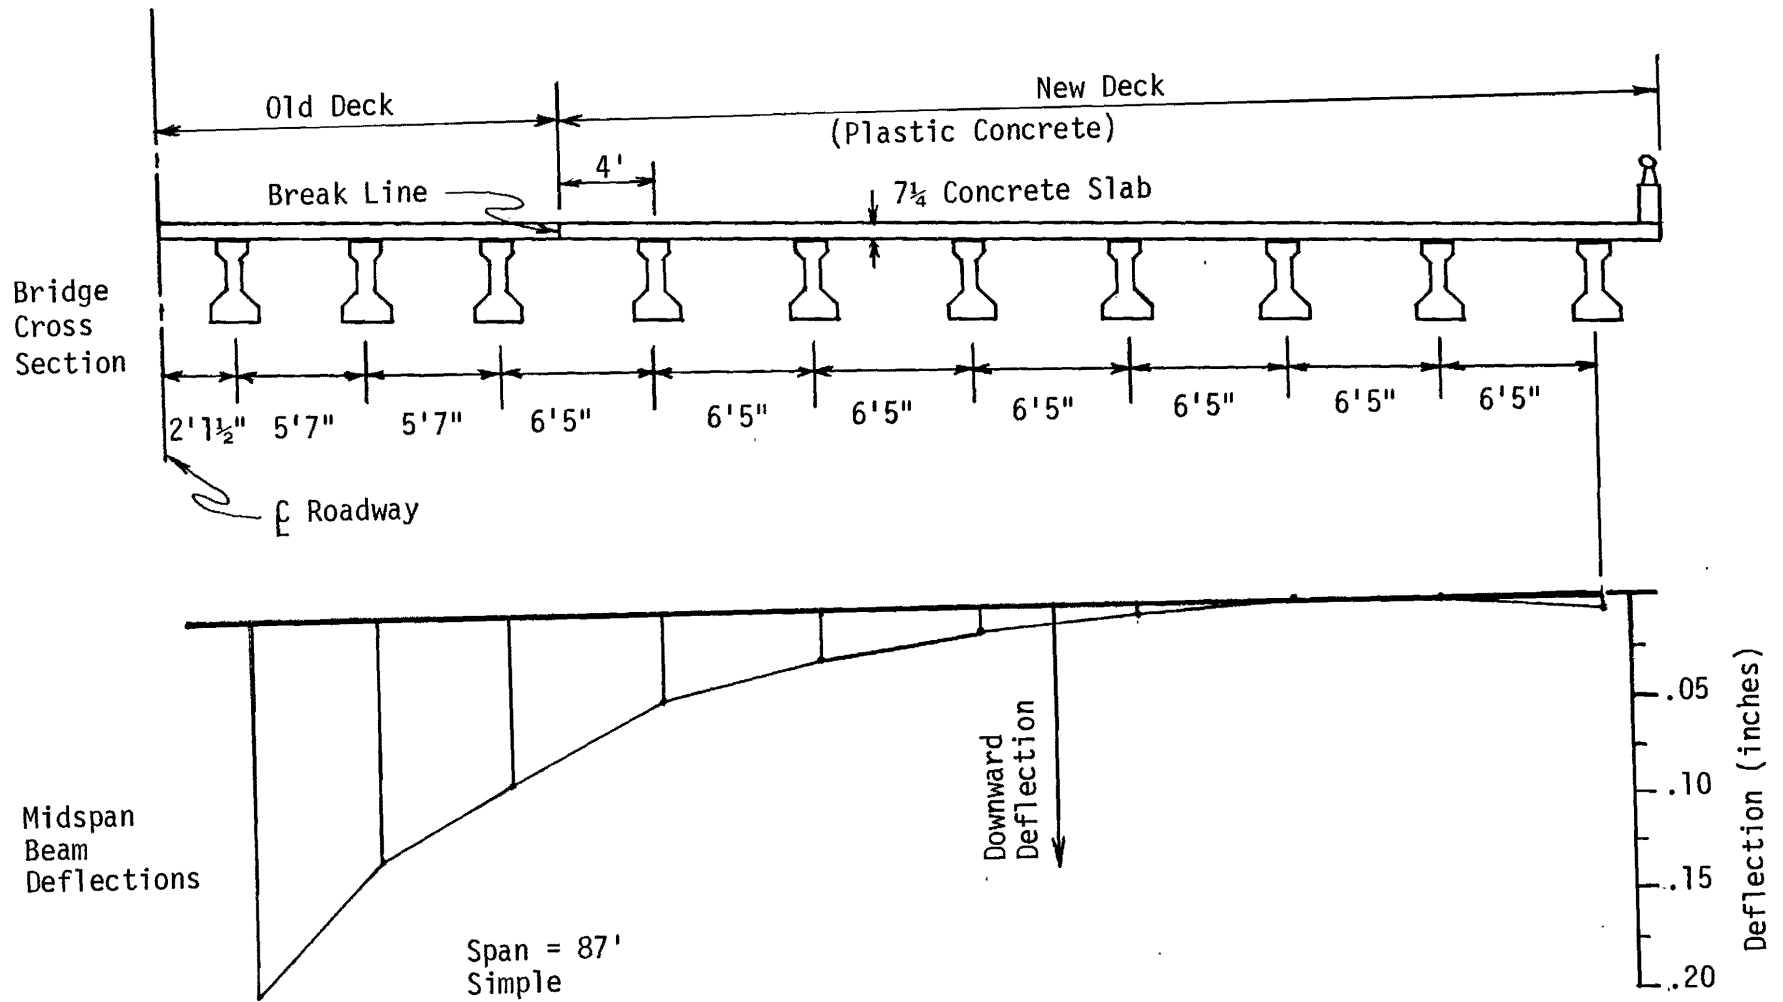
b. I-10 & Dell Dale Ave., Houston, Maximum Midspan Beam Deflection for One Crossing.
